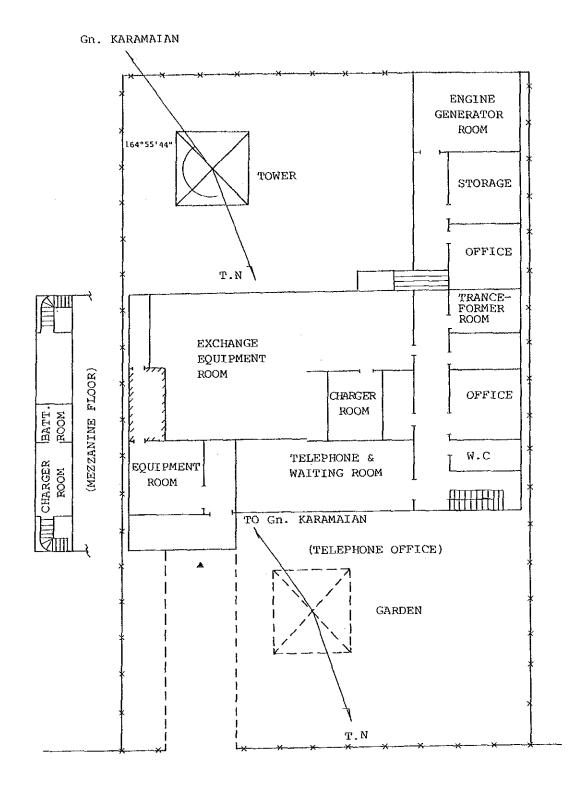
Gn. Karamaian Repeater Station Layout Plan
